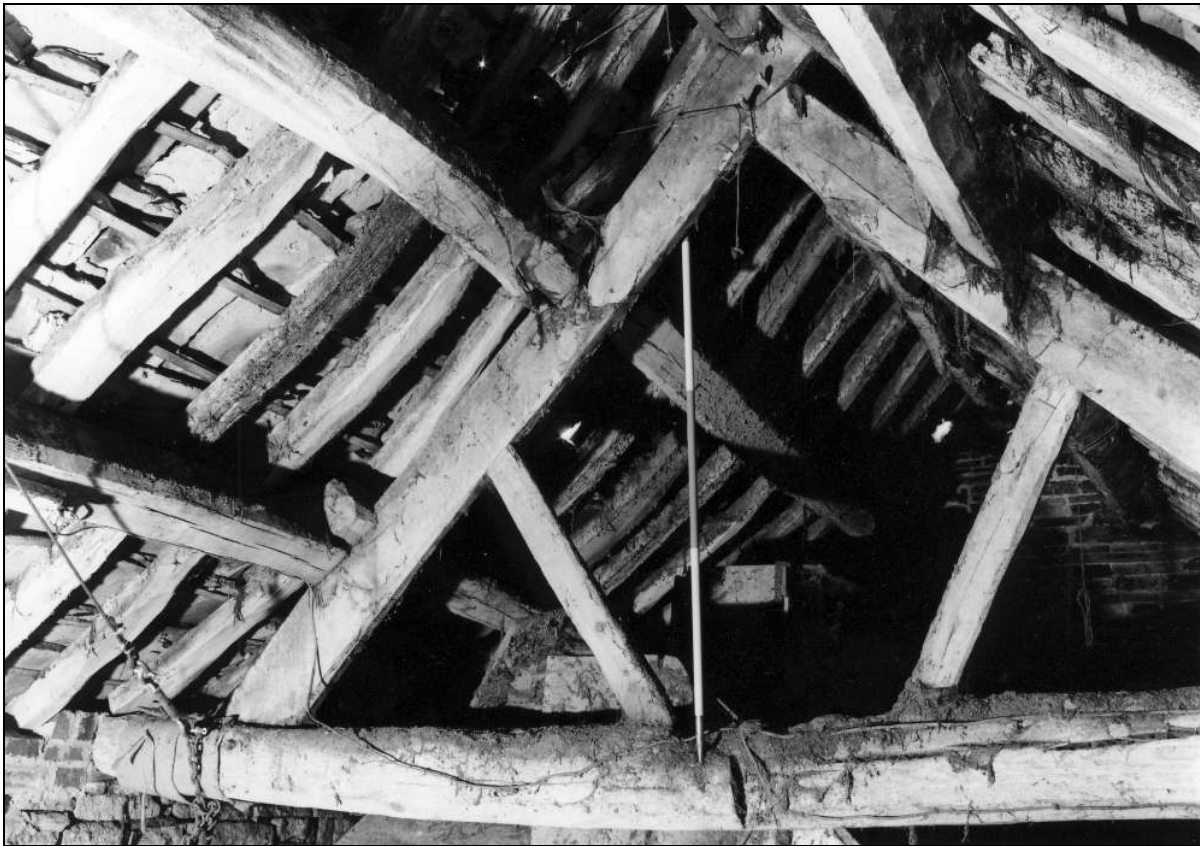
Barn interior: south-west roof truss, from the north (film 5, frame 15)
